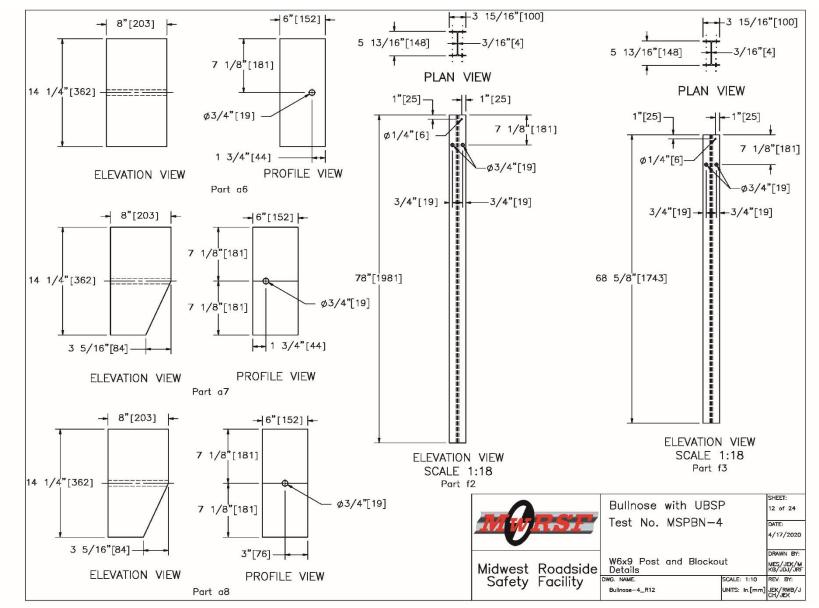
W6x9 Post and Blockout Details, Test No. MSPBN-4
